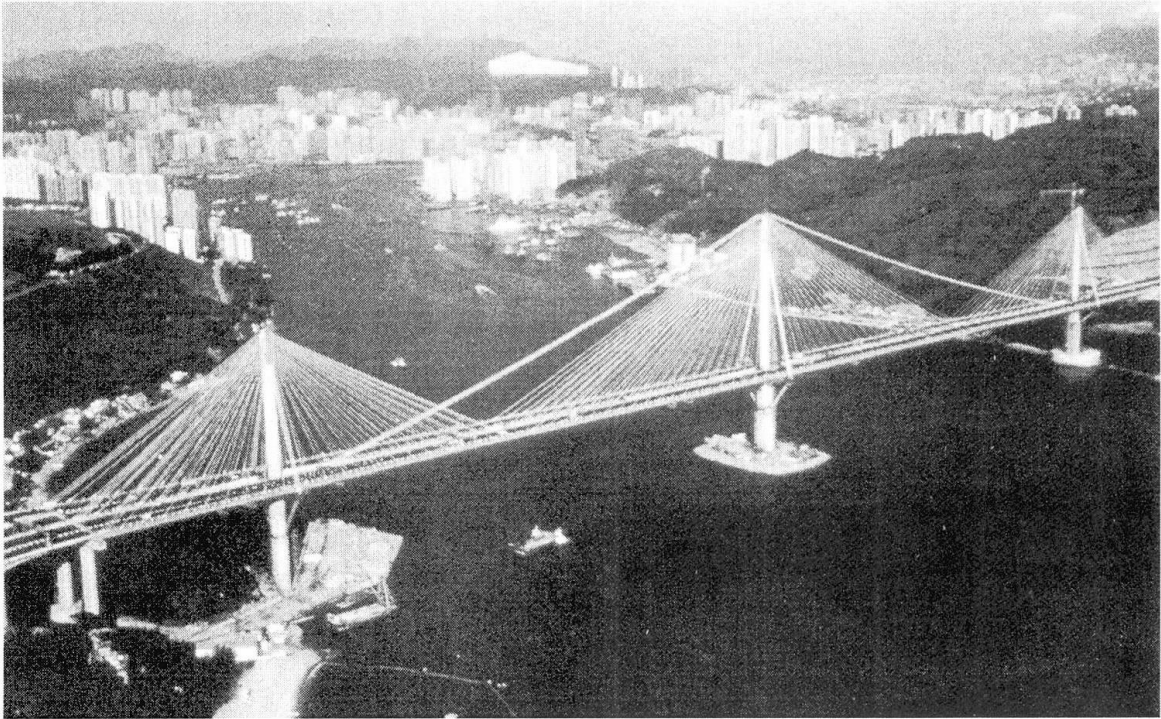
Ting Kau Bridge, Hong Kong, completed 1998
